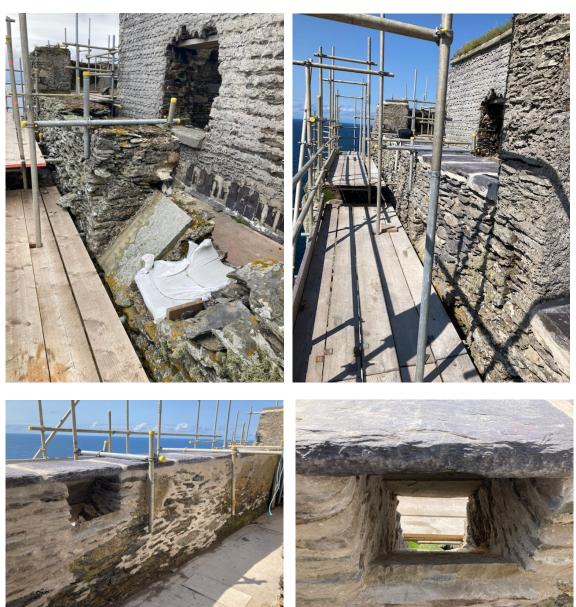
Before & after photographs of parapet wall and details of rubbish chute behind House 2
